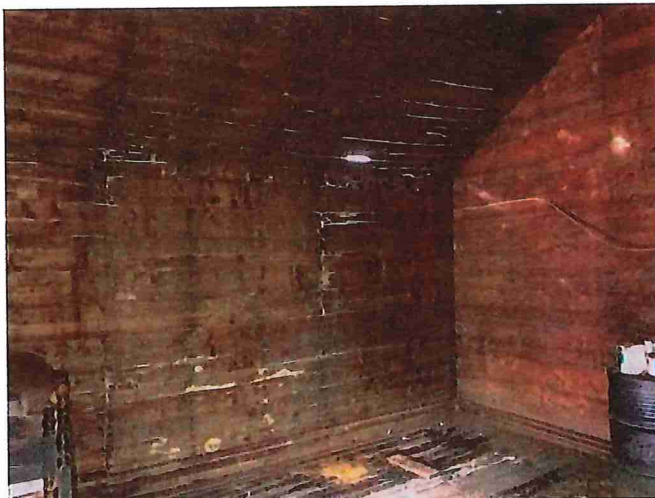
Northeast corner of the Storage Barn wall and floor showing water damage
